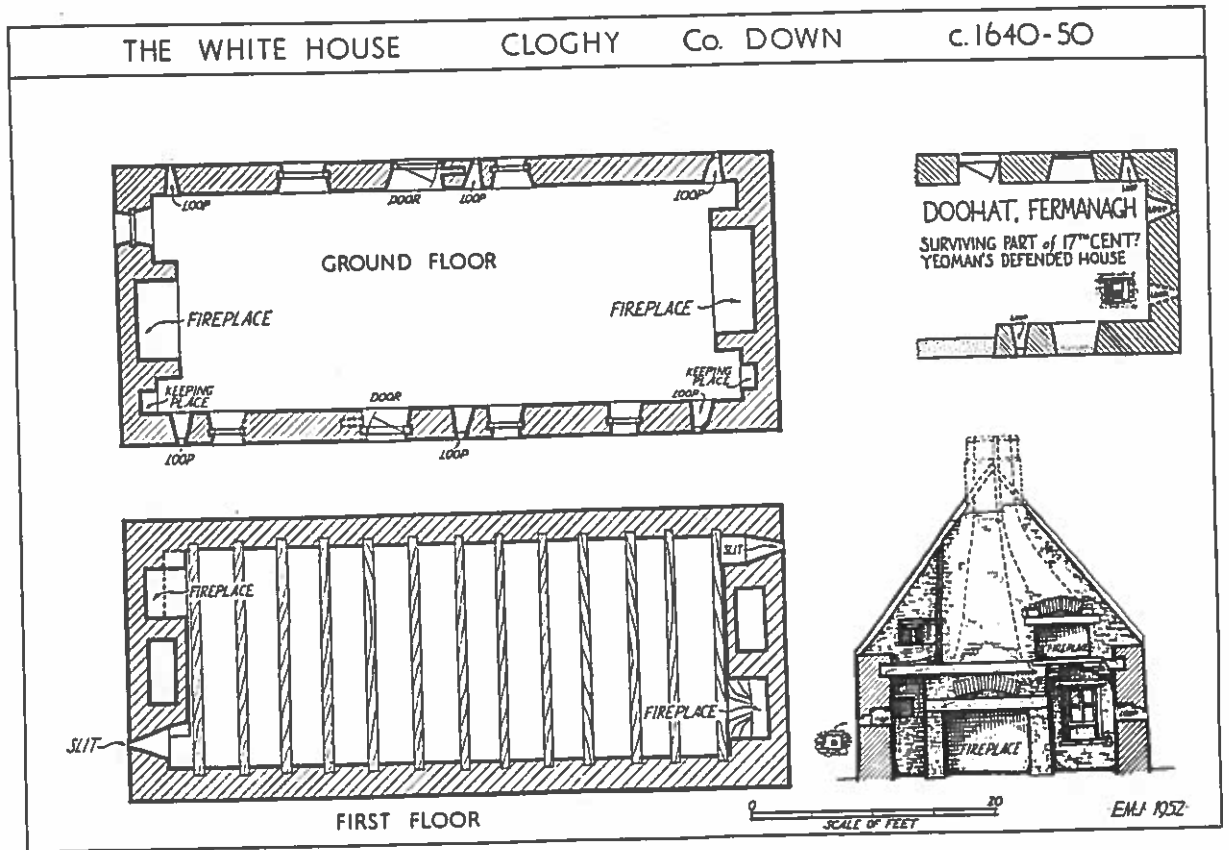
Plans and section of the White House, Ballyspurge Townland, near Cloghey, on the Ards. This is a good example of a 1½-storey house, the upper floor probably lit by dormers. The plan is shown reconstituted, with the first floor joists in position (for surviving remains see *Archaeological Survey of N. Ireland: Co. Down* (1961), fig. 169). Parts of the bawn and its gateway survive. The end of a 1½-storey thatched house at Doochat, Co. Fermanagh, shows another with pistol-loops built-in at the angles.
